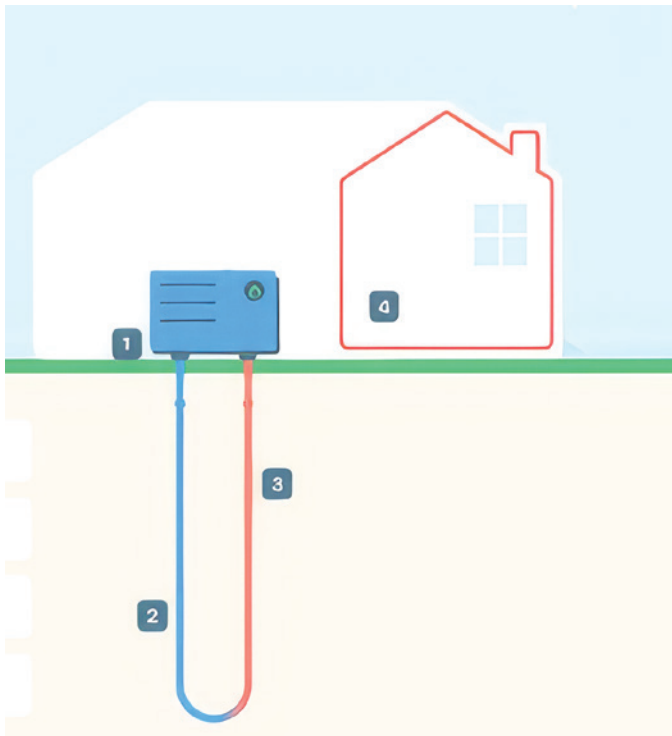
TYPICAL EXCAVATION AND INSTALLATION OF VERTICAL GROUND SOURCE HEAT PUMP LOOP (SELF BUILD)
